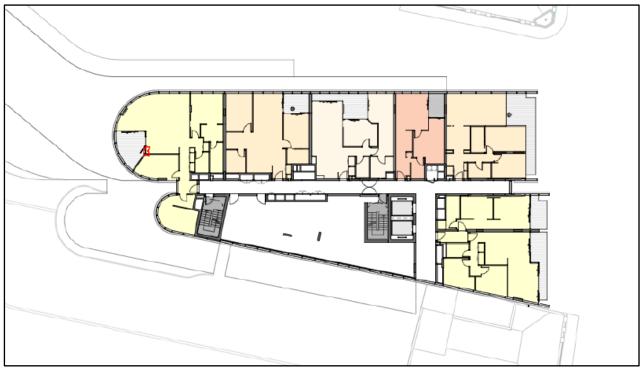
Level 13 as approved under SSD 6376 (source: Applicant's EIS)
